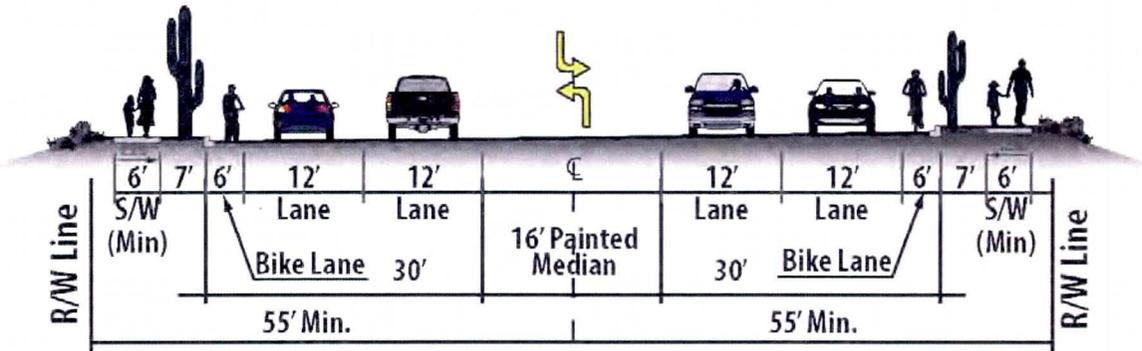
Ultimate Roadway Cross Section – Lost Dutchman Boulevard to Southern Avenue
